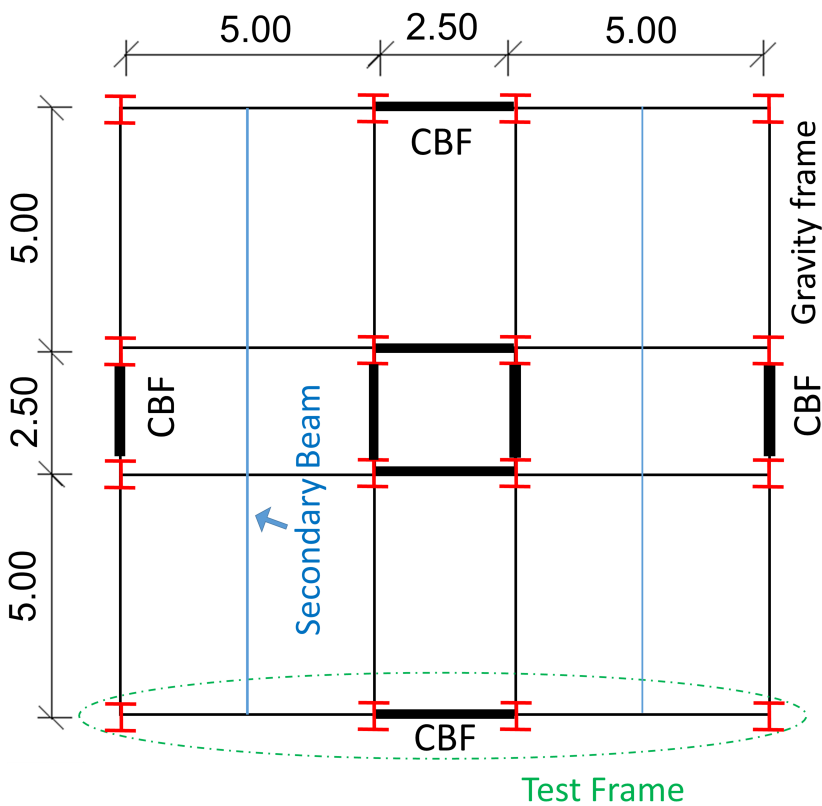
Typical Floor Framing Plan. Dimensions are in meters.
